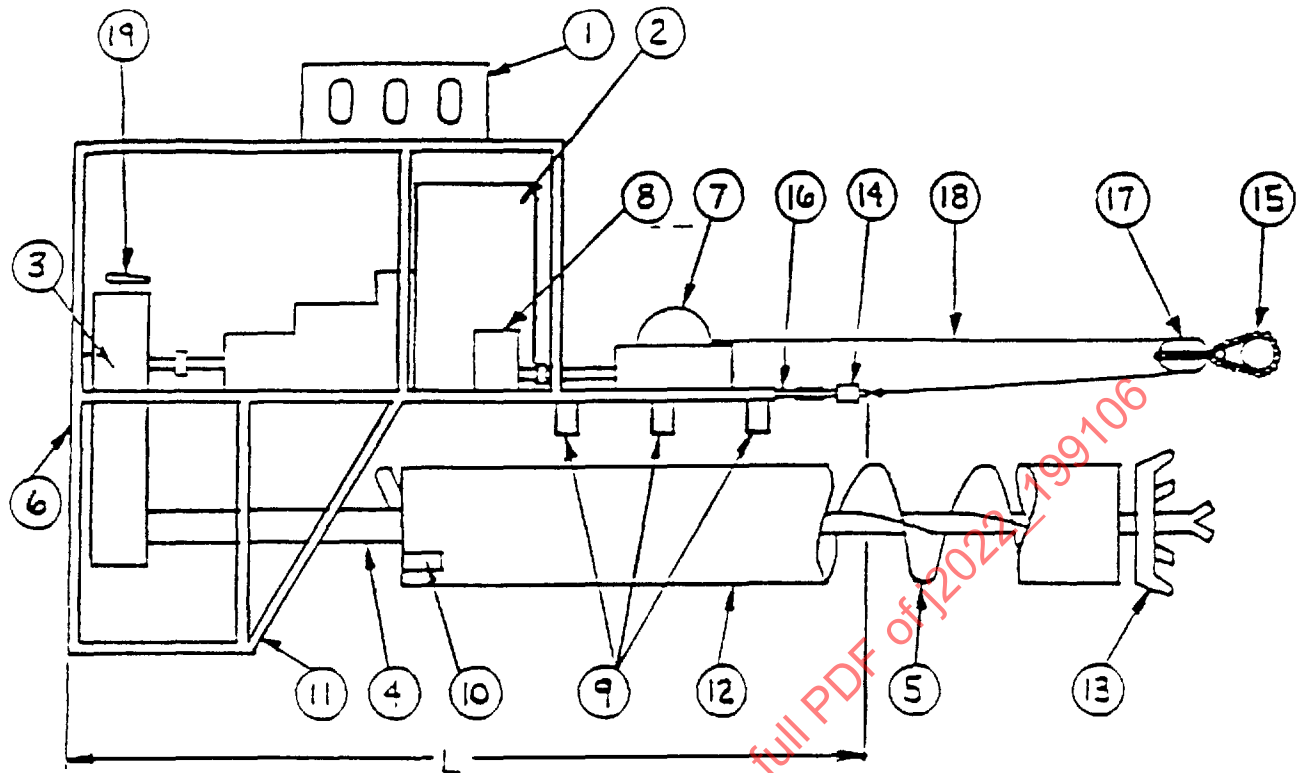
CRADLE-TYPE AUGER BORING MACHINE
